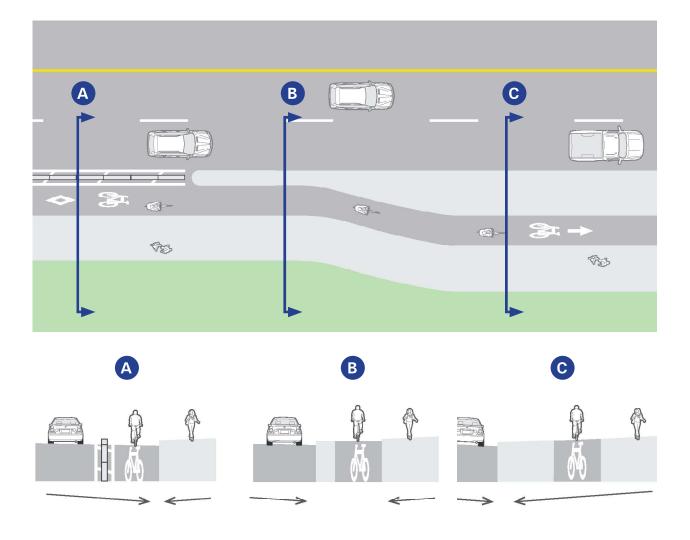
Transition Between On-Road and In-Boulevard Facility
